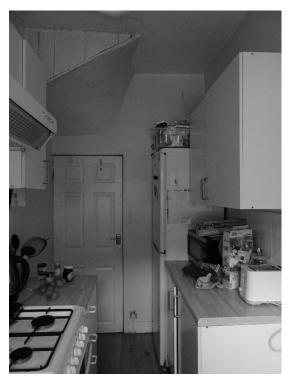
View of the scullery kitchen facing towards the rear of the house. The door leads to the basement steps, and above, the sweep of the stair leading to first floor can be seen, clad in timber panels, and underdrawn with plaster.
